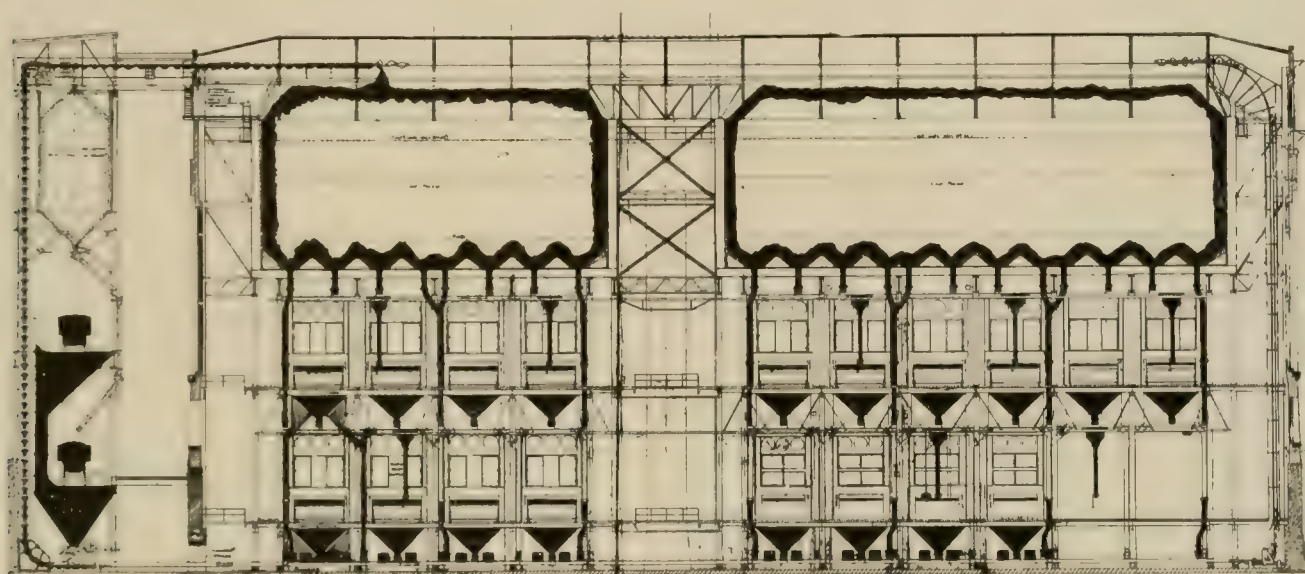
SECTION SHOWING COAL HANDLING INSTALLATION.
